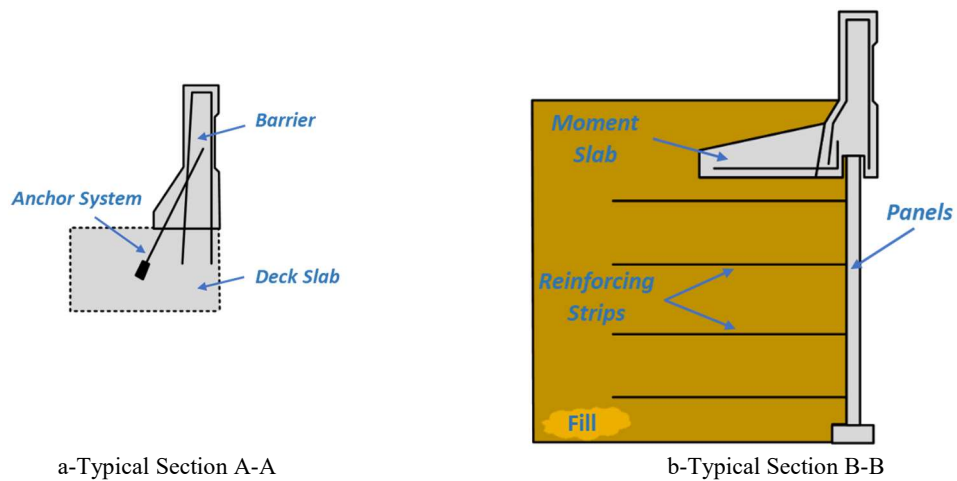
Sketches of typical sections at (a) bridge deck and (b) bridge approach
